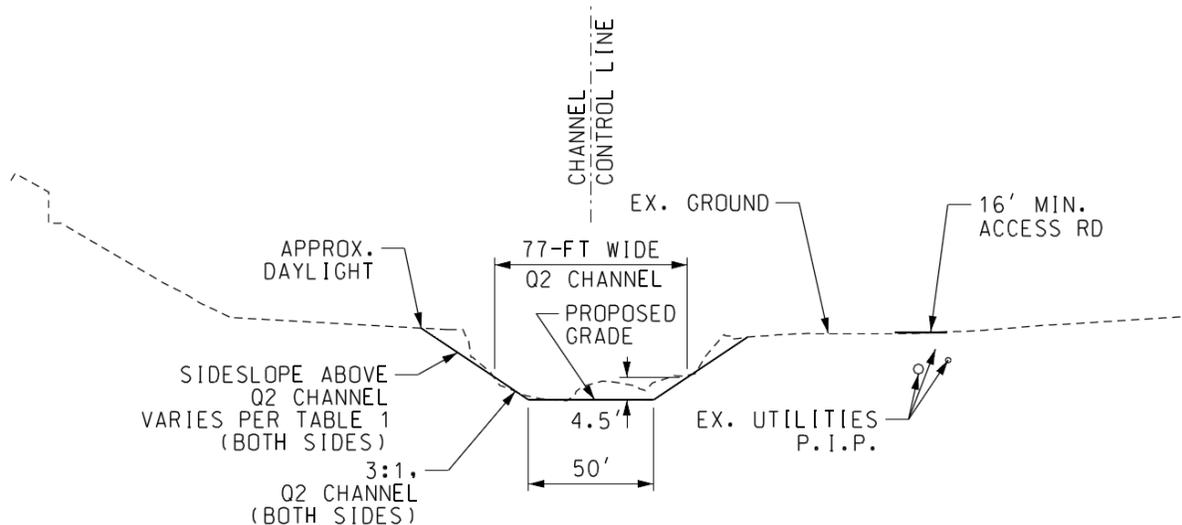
Typical Channel Design Section (Alternative 2)
